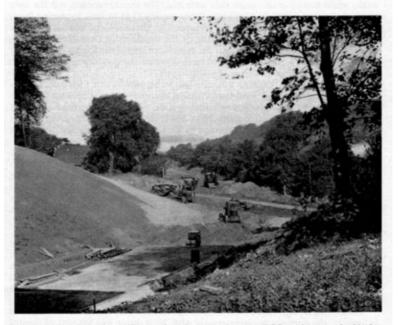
Earth works in the Church Crossing area where the KCC road crosses the Upchat road.
